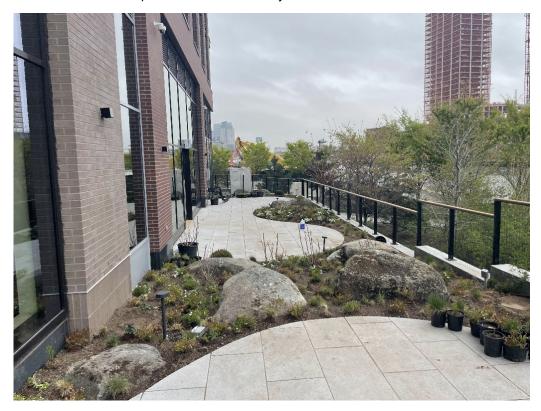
Photo of the final permanent Site cover system and landscaping (looking northeast).
